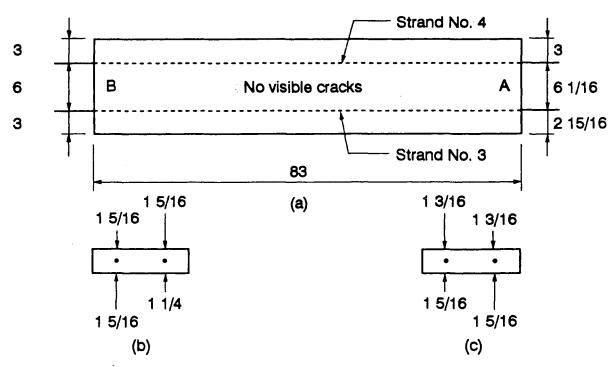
Specimen No. 3-2.5TC-2 (dimensions shown in inches):
